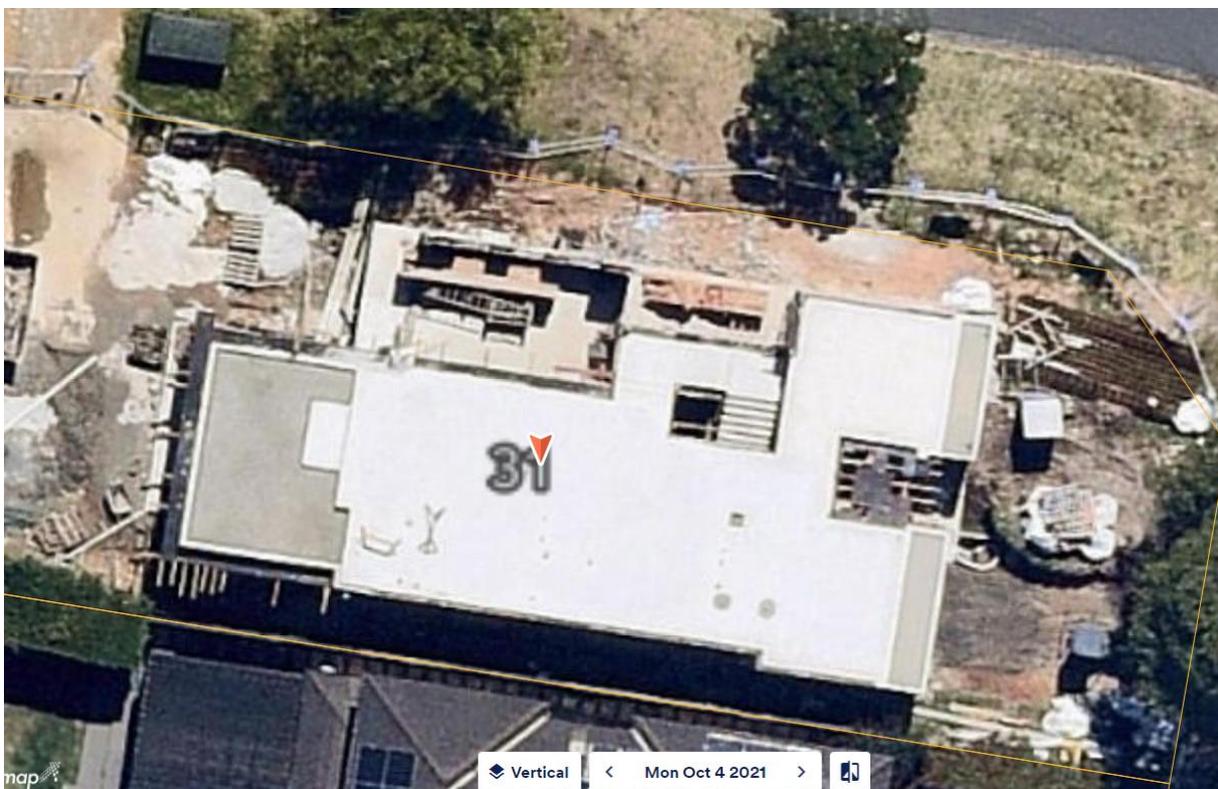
Aerial imagery of the subject site taken on 4 October 2021 showing slab of first floor already constructed (source: Nearmap).
